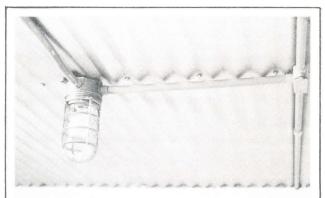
Either conduit or Type UF cable wiring circuits may be used in swine buildings. Wiring should be attached to interior surfaces of building—not concealed in wall, ceiling, or attic—to reduce condensation and rodent damage and facilitate periodic inspection. moist room air moving into wall or ceiling cavities and attics with resulting condensation. Surface mounting also reduces the risk of rodent damage and allows periodic inspection and repair.
